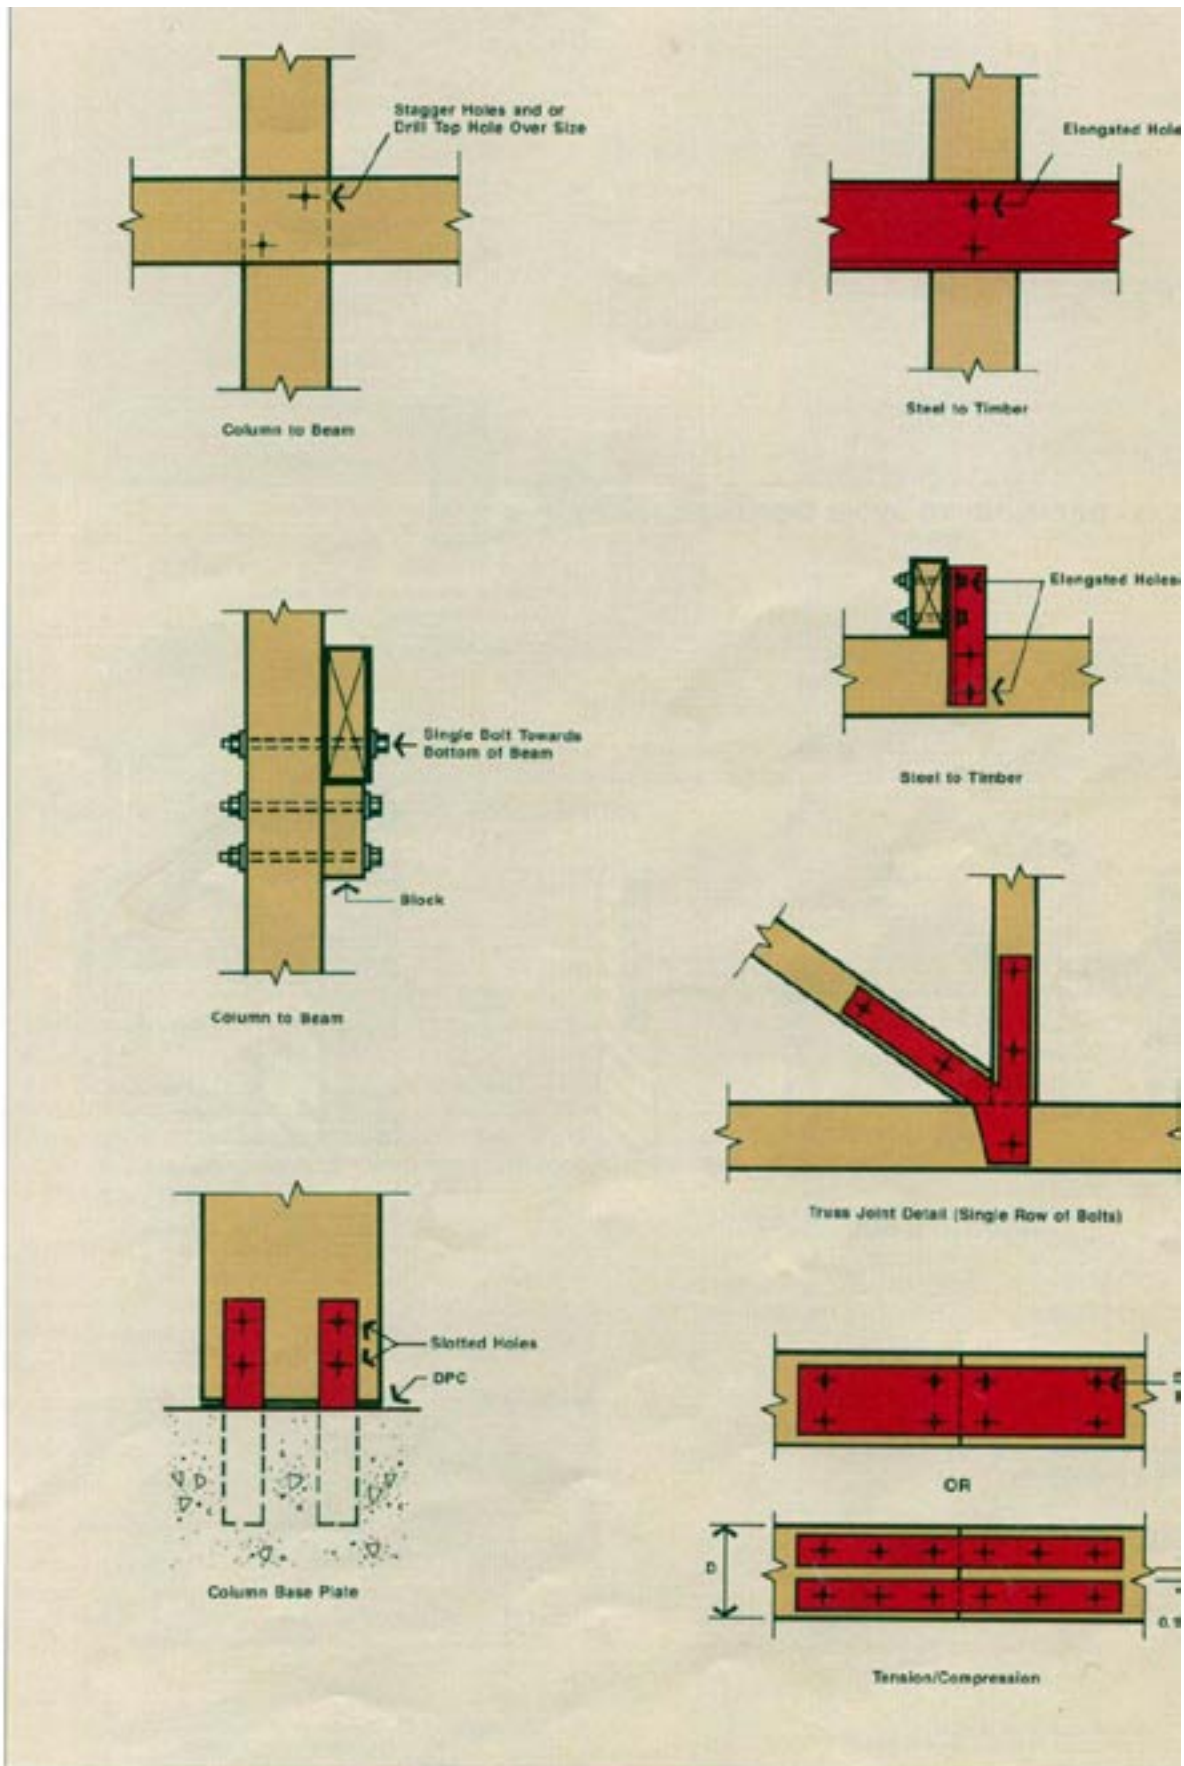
Detailing to allow for shrinkage and/or moisture movement.
